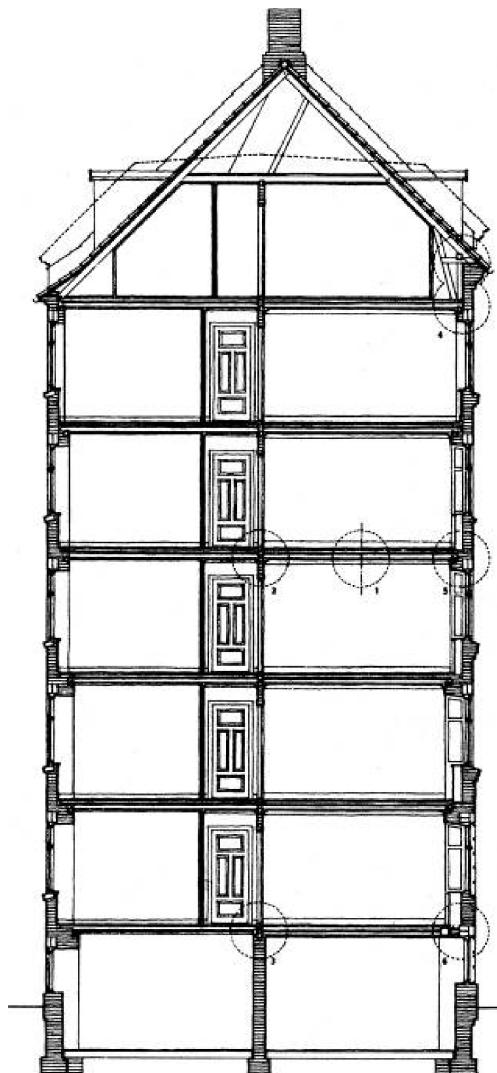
Typical historic multi-storey building in BSR constructed with a thermal envelope of brick. Before 1920 the horizontal partition was constructed by timber beams. Later horizontal partitions of concrete were introduced.
